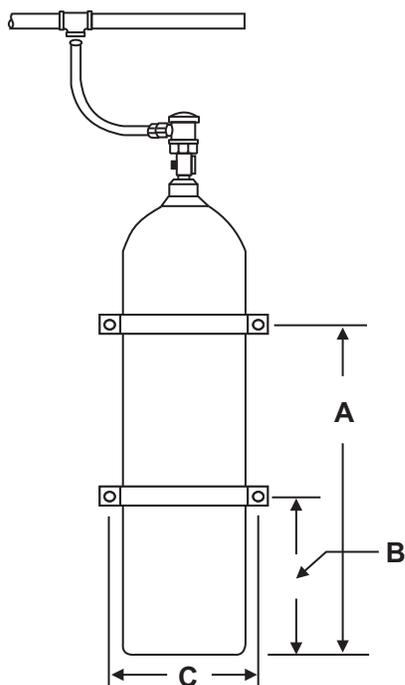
Typical 1040 and 2300 cu. in. Pilot (Driver) Cylinder Strap Installation (P/N 90-101040-000 and 90-102300-100)
